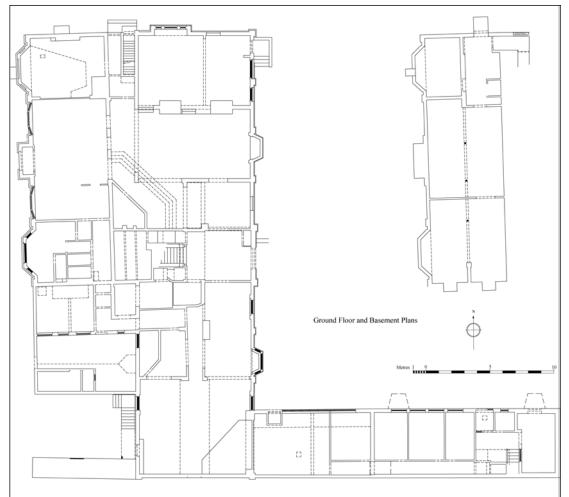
Ground floor and Basement layout amended from plans supplied by MAS Architecture Ltd drawing.
